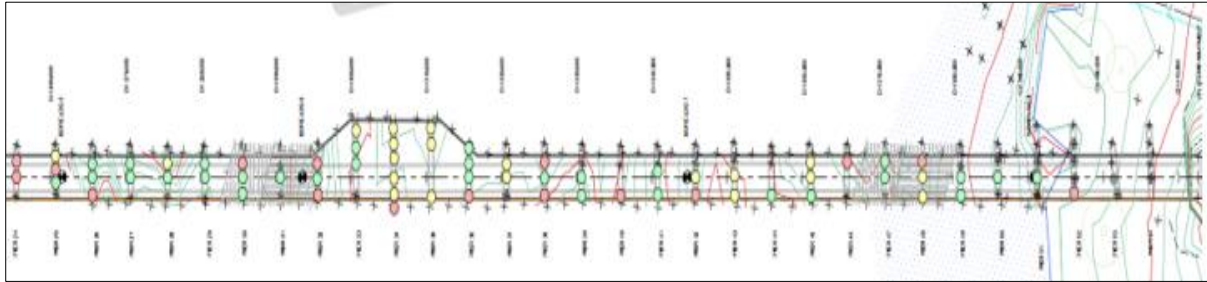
Bridge Plan Enlargement 2 (Source: Ref [1])
